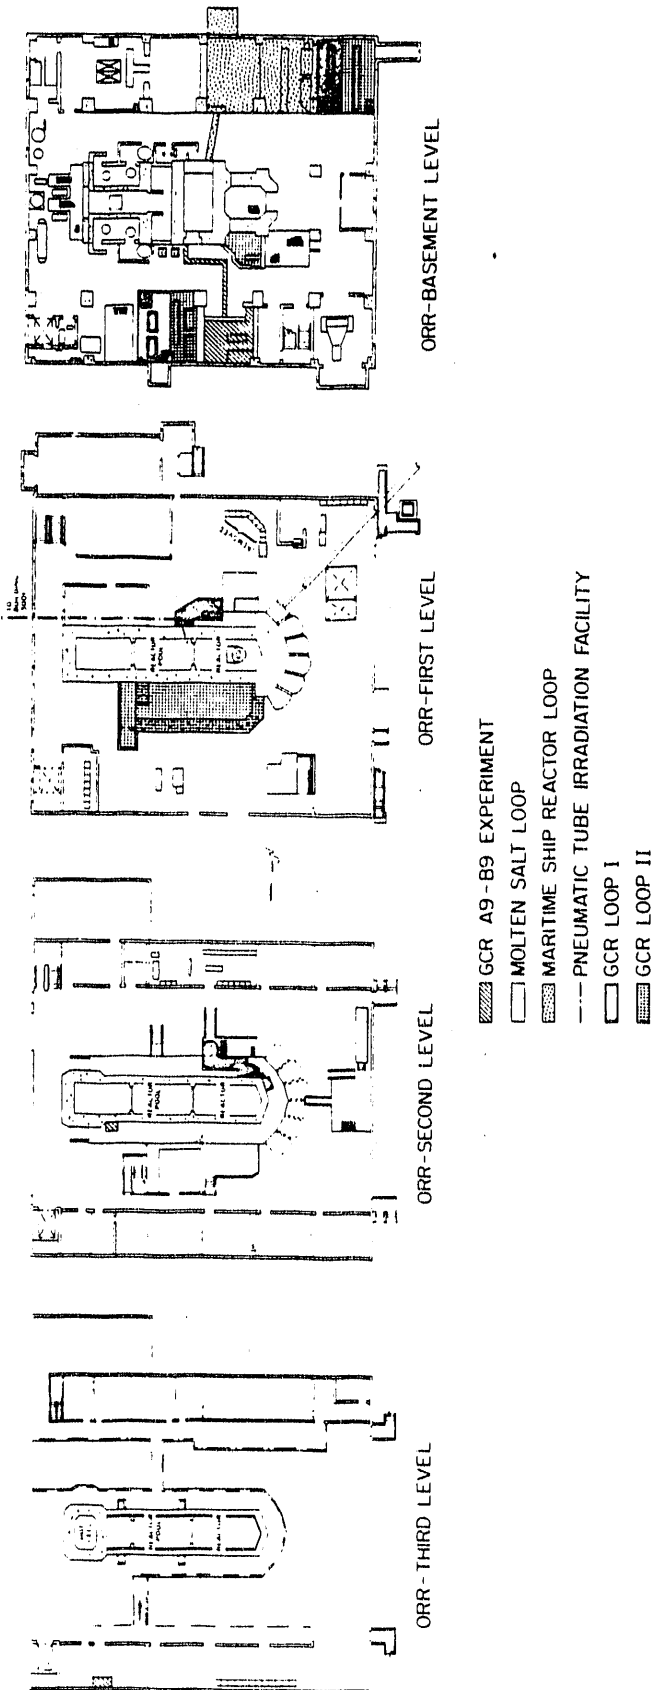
Plan view of the ORR, highlighting the locations of the Experimental Facilities.
